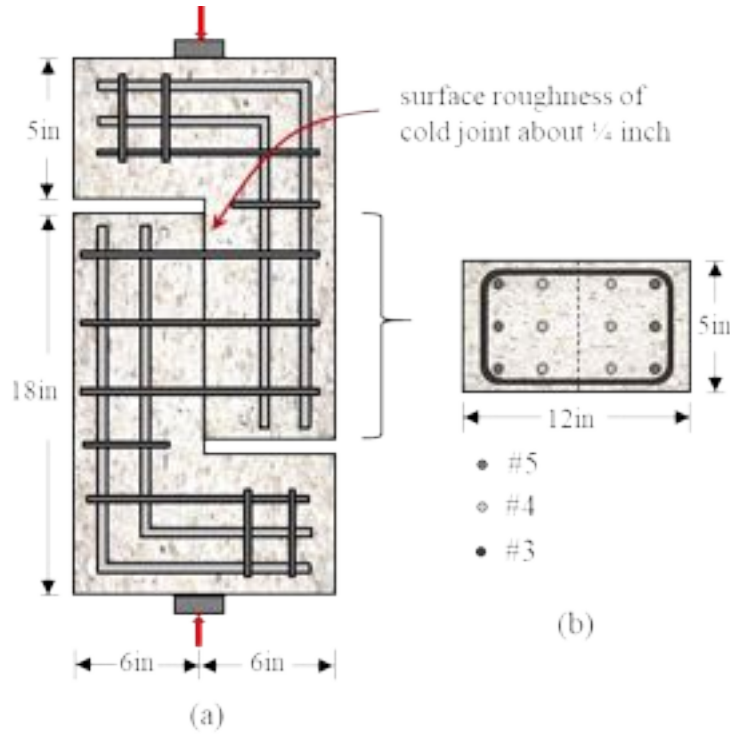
Push-off specimen created by Kahn and Mitchell. (a) Geometry details, and (b) Interface elevation and reinforcement details.
